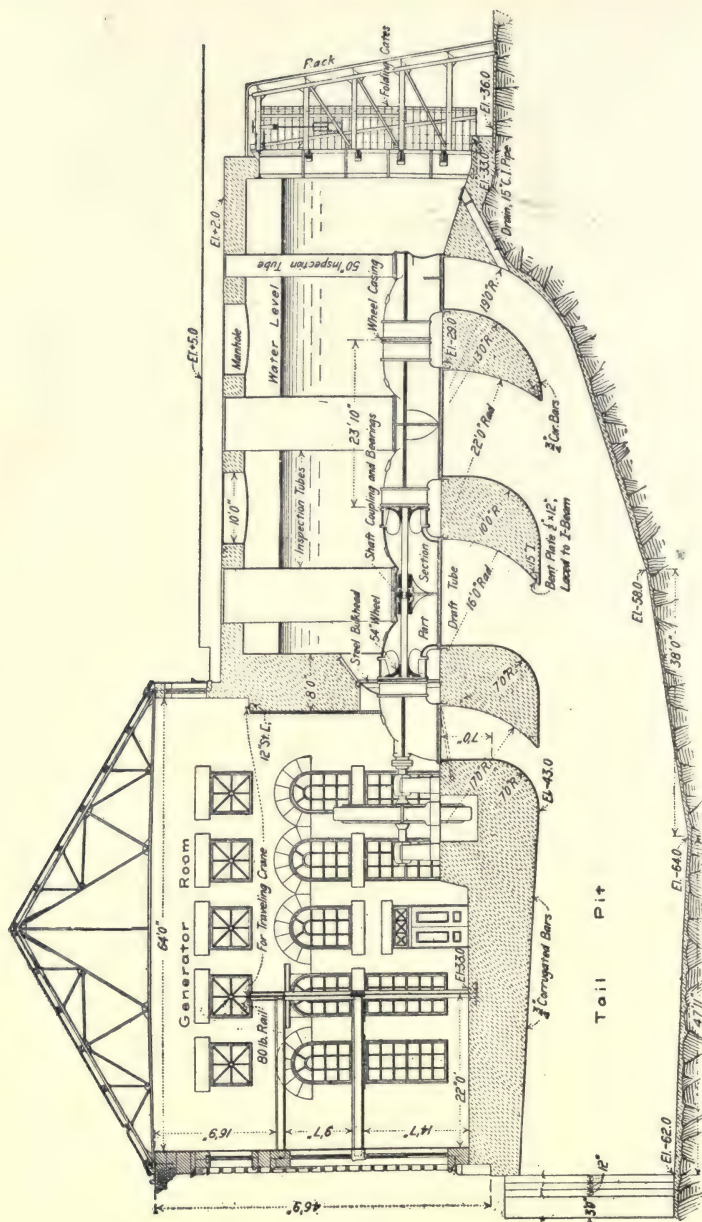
Section of Power-house on Chicago Drainage Canal.
